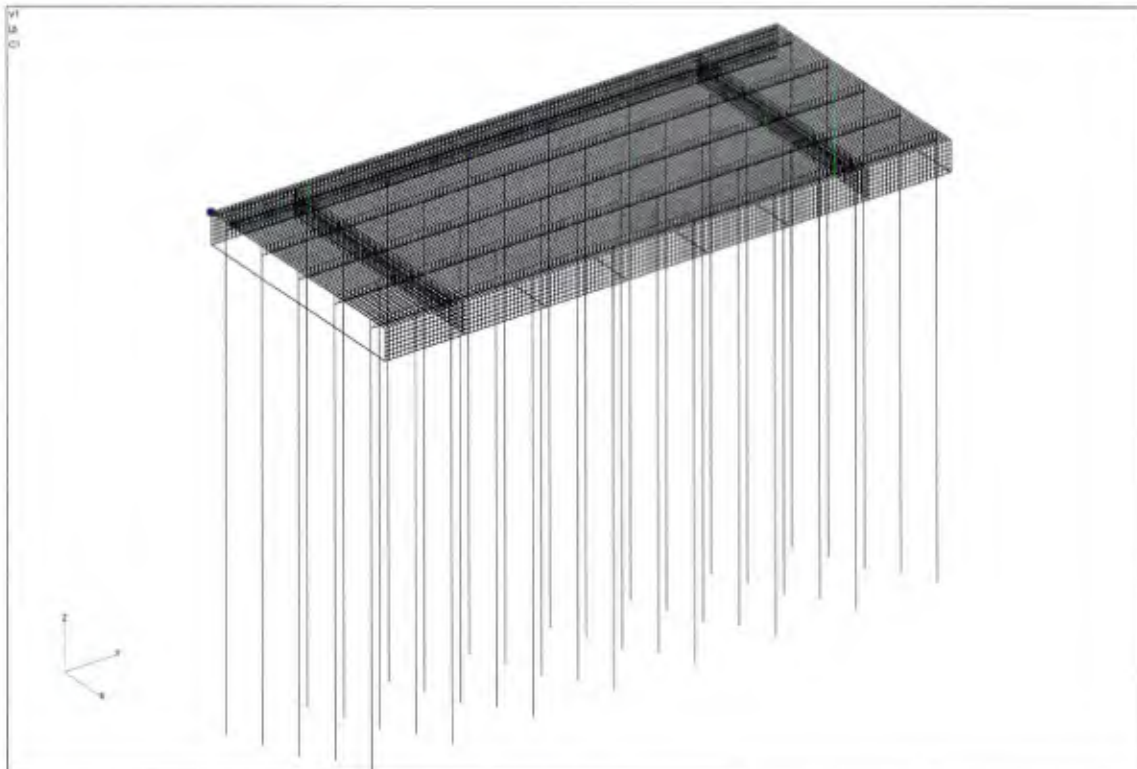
Detailed FEA model of Marginal Wharf platform between shear walls.
